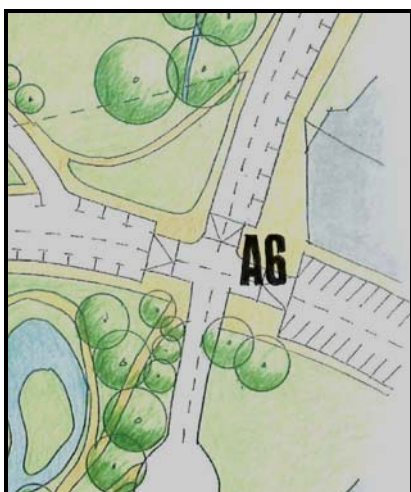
Eliminate parking in the reserve and slipways to the commercial frontage, replace with roadside parking on Ardmore Street and introduce a shared space zone at the intersection of Ardmore and Helwick Streets. (Parking layout is indicative only).
